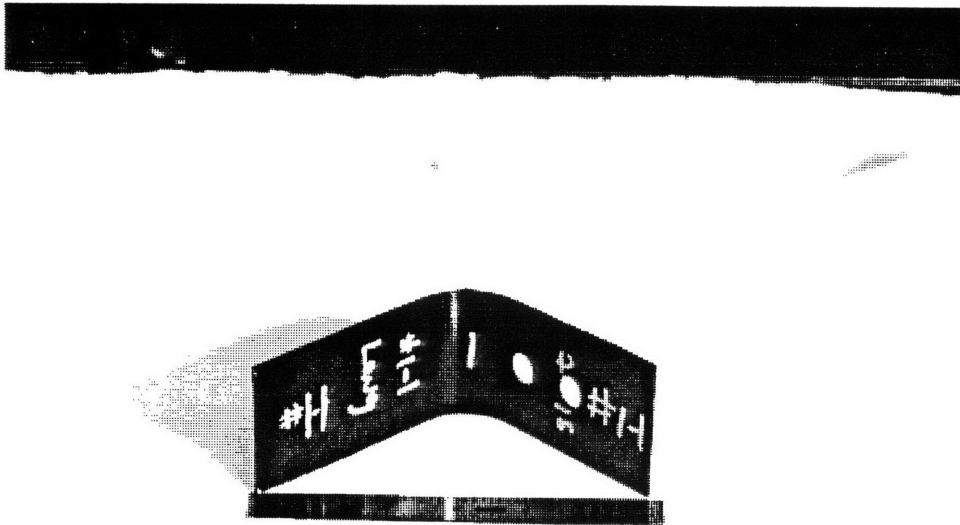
Picture of specimen T70/20/10-20 after testing.
